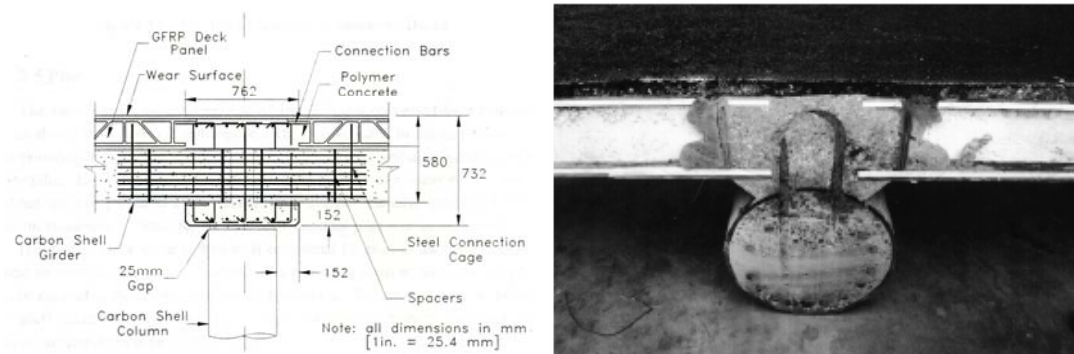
Geometry of Kings Storm Water Channel Advanced Composite Bridge
